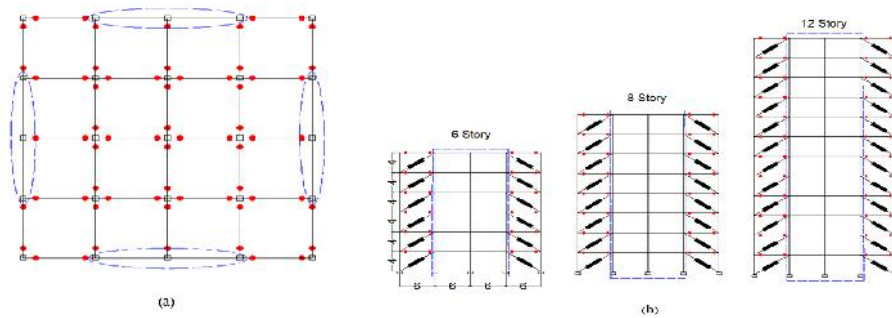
(a) Plan of 3D steel structure (b) Lateral load bearing system of structure (dashed line indicates bending moment frame).
